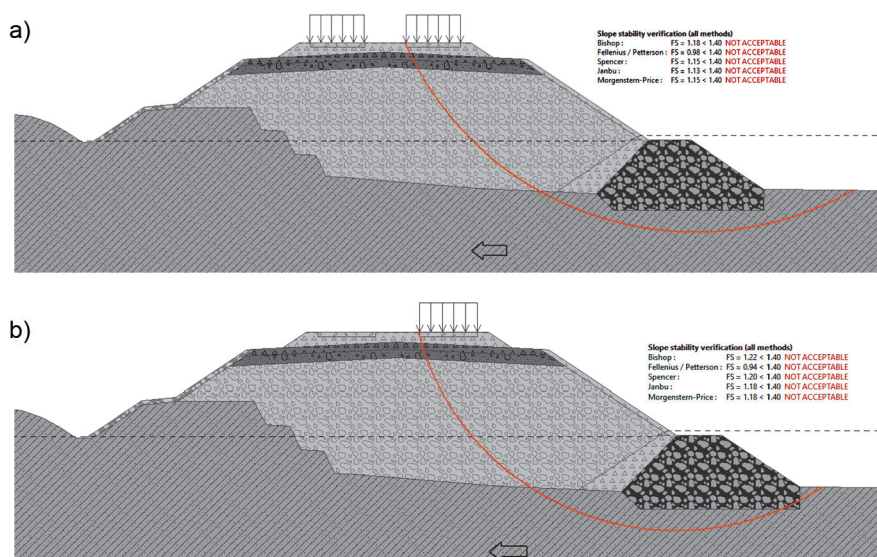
Slope stability analysis of railway embankment: a) two tracks loaded; b) one track loaded
